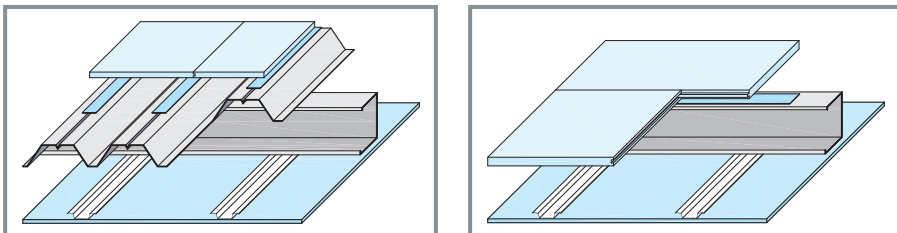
Room-in-room system with bracing ceiling and wall structure
